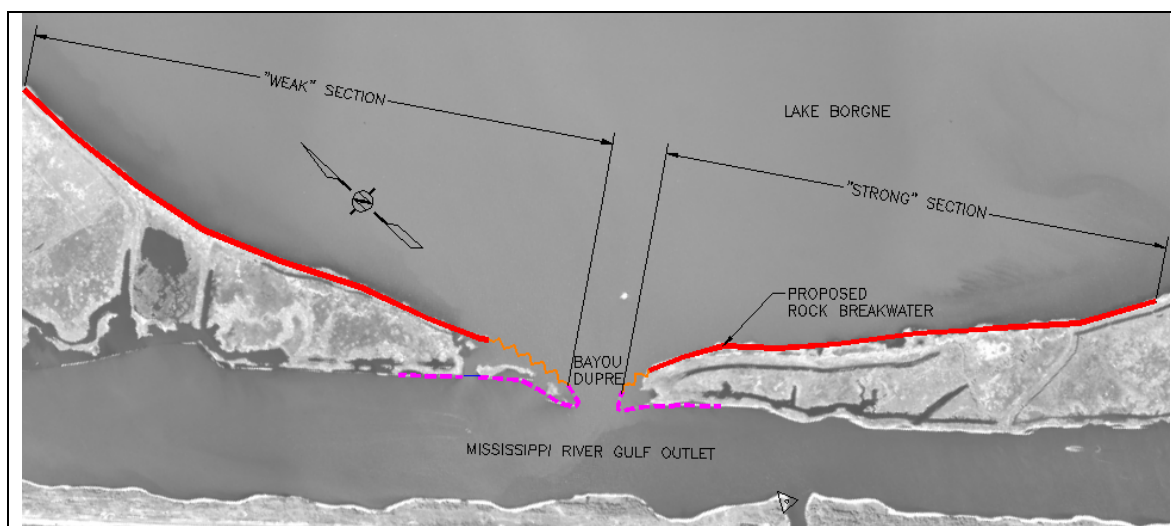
(NTS) – “Weak” and “Strong” Soil Settlement Sections at Bayou Dupre Section
